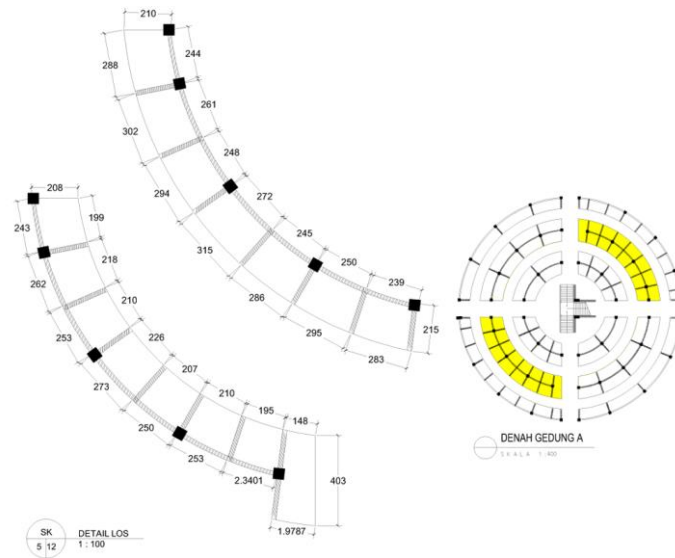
Two-Faced Eight-Row Stall Layout Block 2 (Building A) (source: author)
